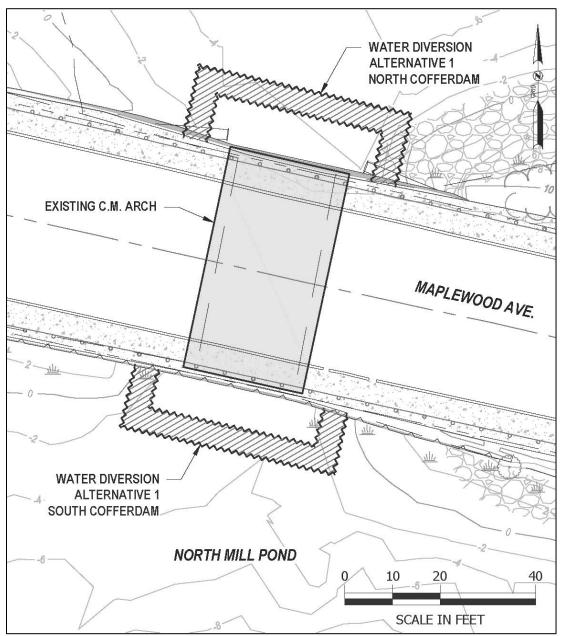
Water Diversion Alternative 1 Schematic Plan
